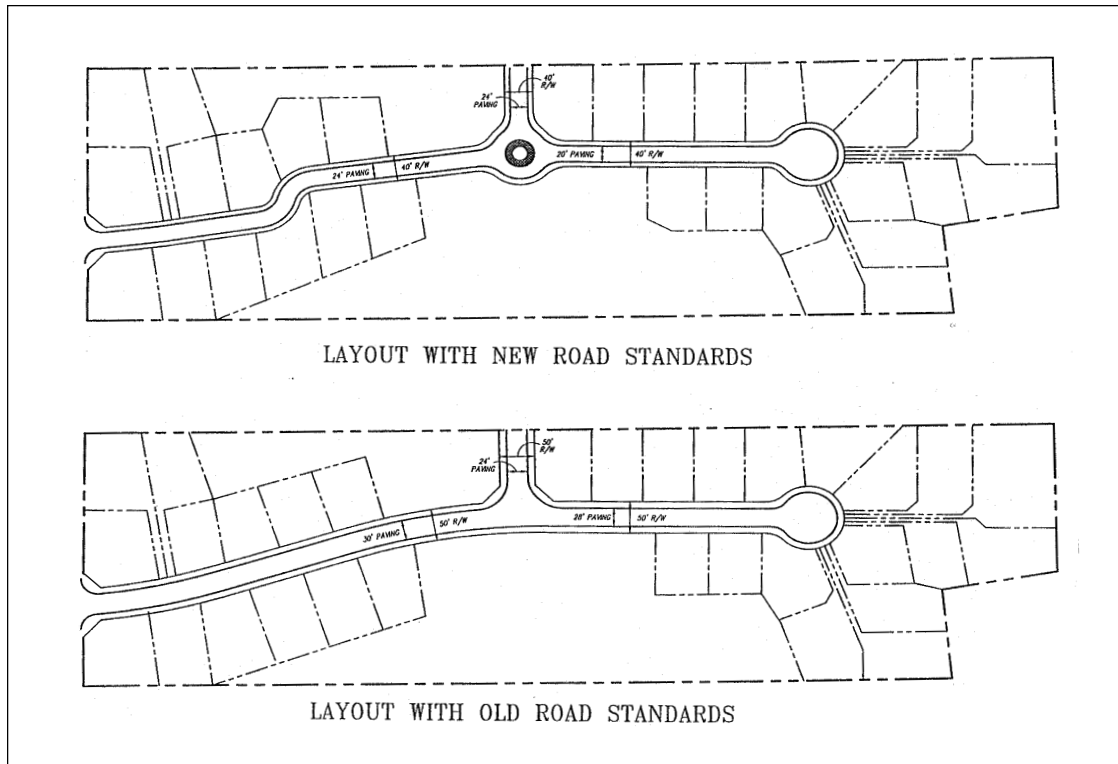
Subdivision Street Design Under Old and New Standards. (Howard County, MD)
